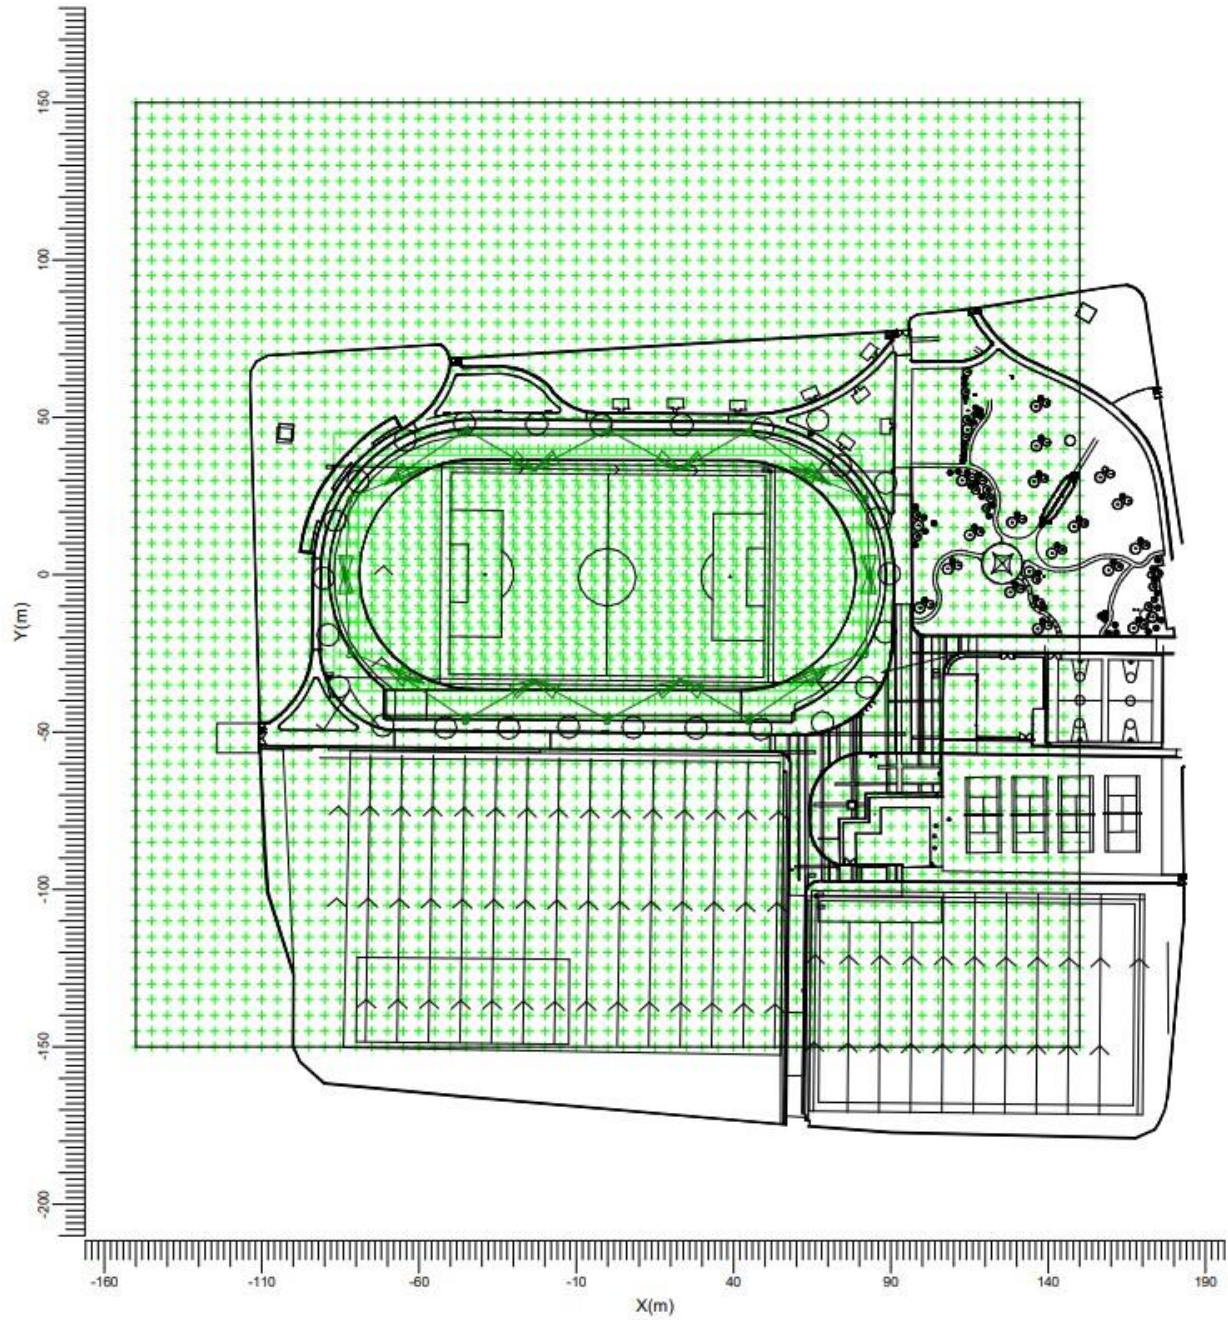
Project overview diagram for Westside Running Track (GCC, 2023)
